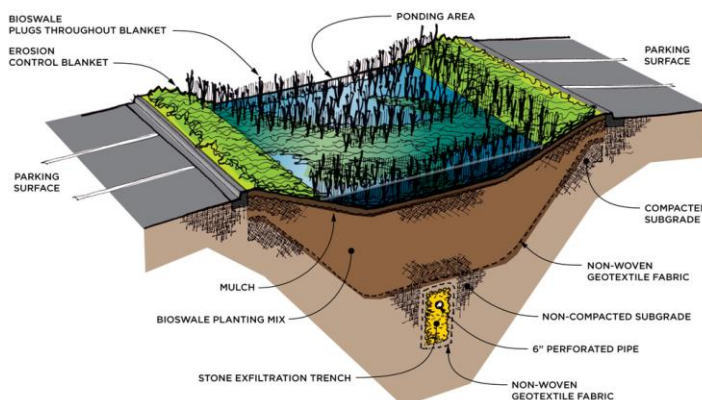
Typical Bioswale Cross Section – (Gartz, 2014)
